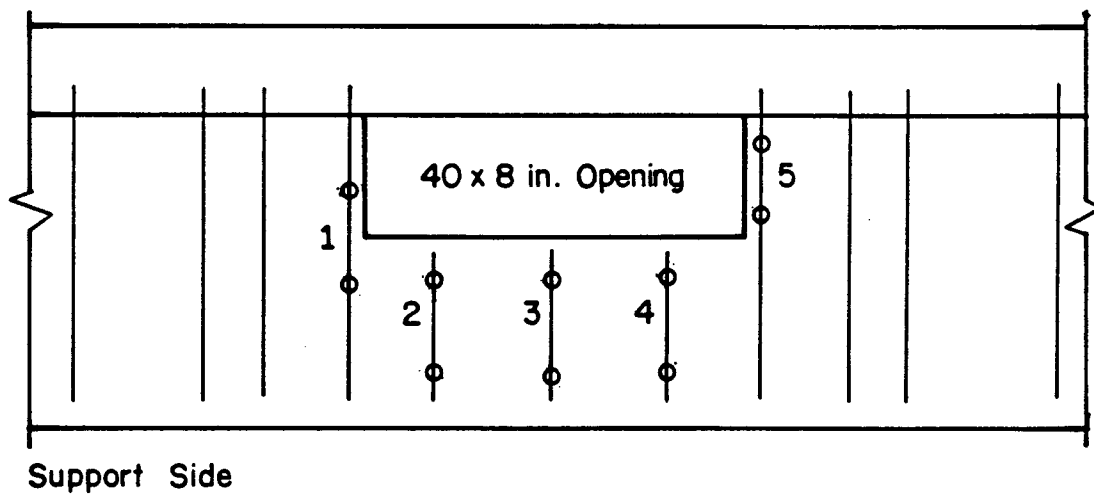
Demec Points on stirrups - BEAM B2 and BEAM D2.
